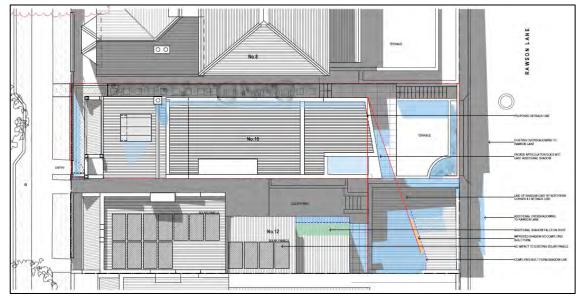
Overshadowing impacts at 12 noon to balcony at 12 Rawson Avenue and Rawson Lane.
